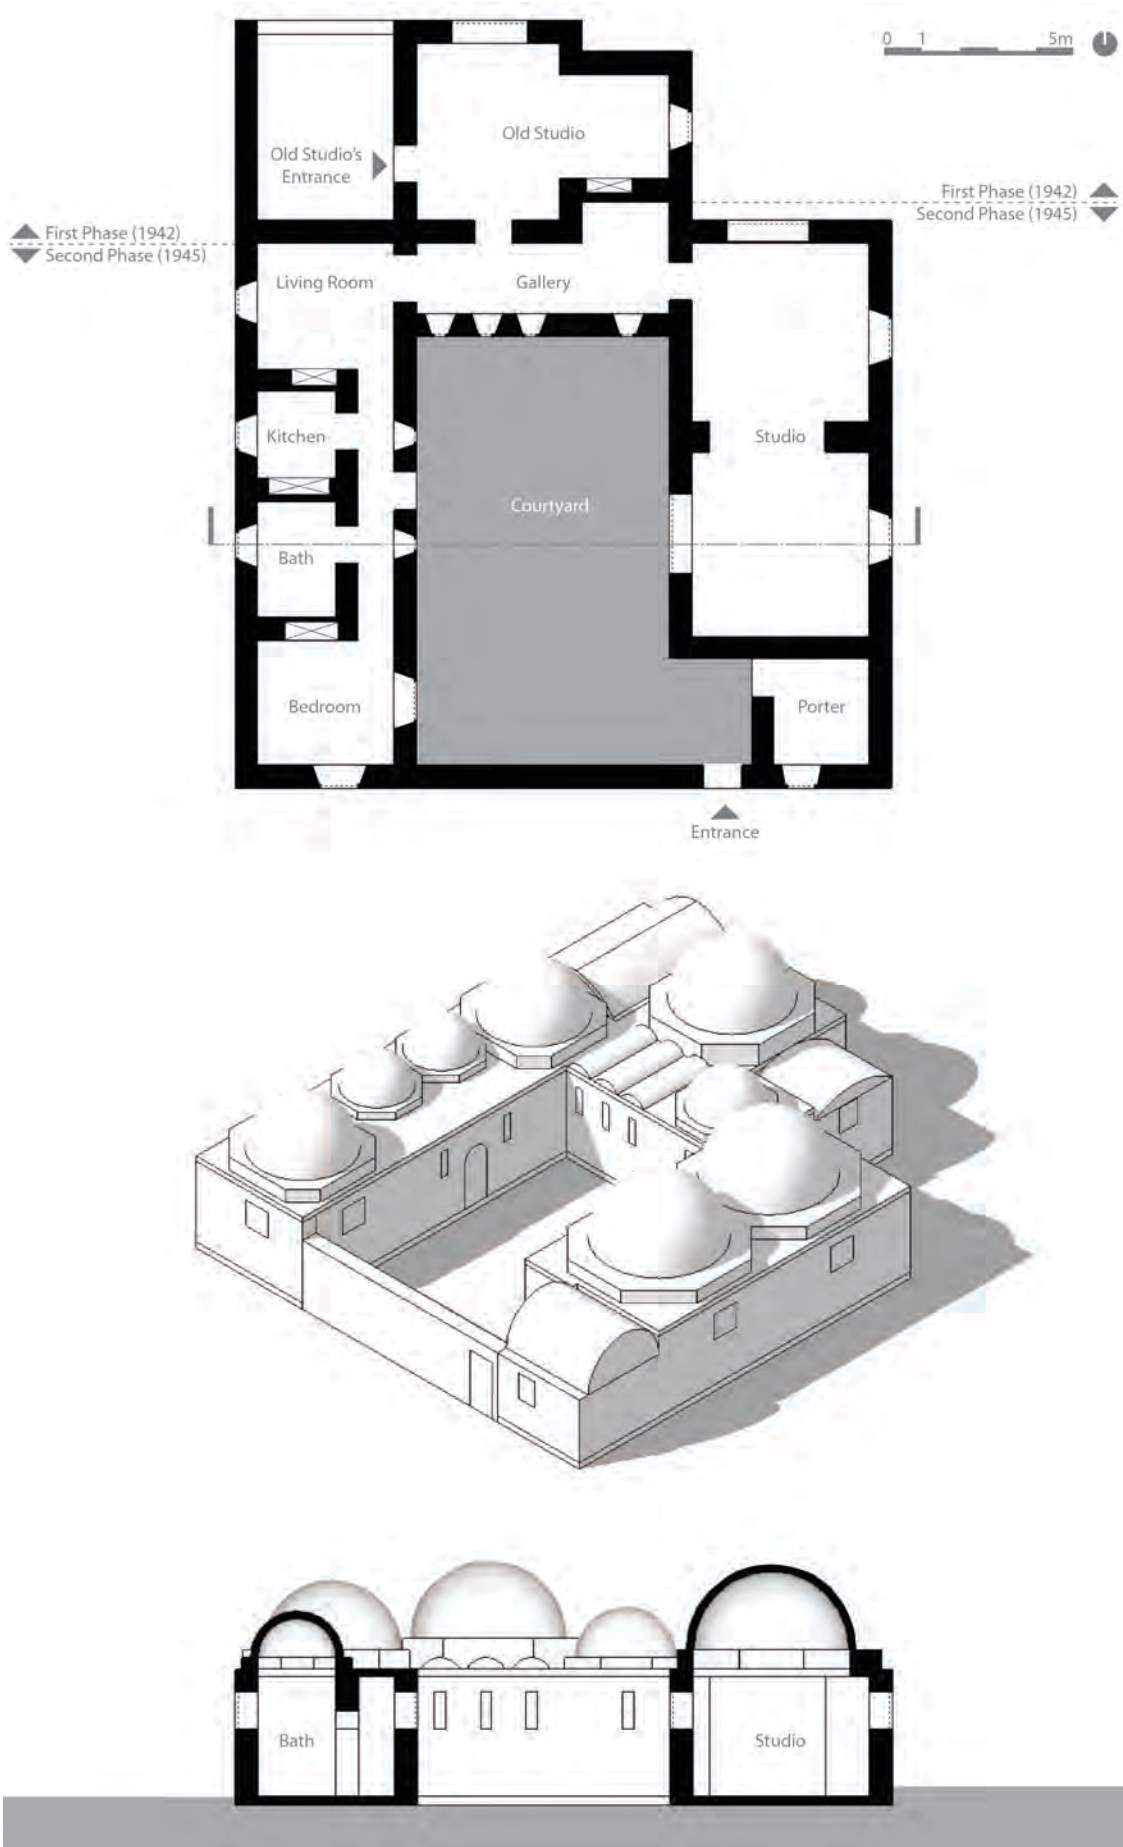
Hamed Said House – Plan, perspective, and section West-East.
